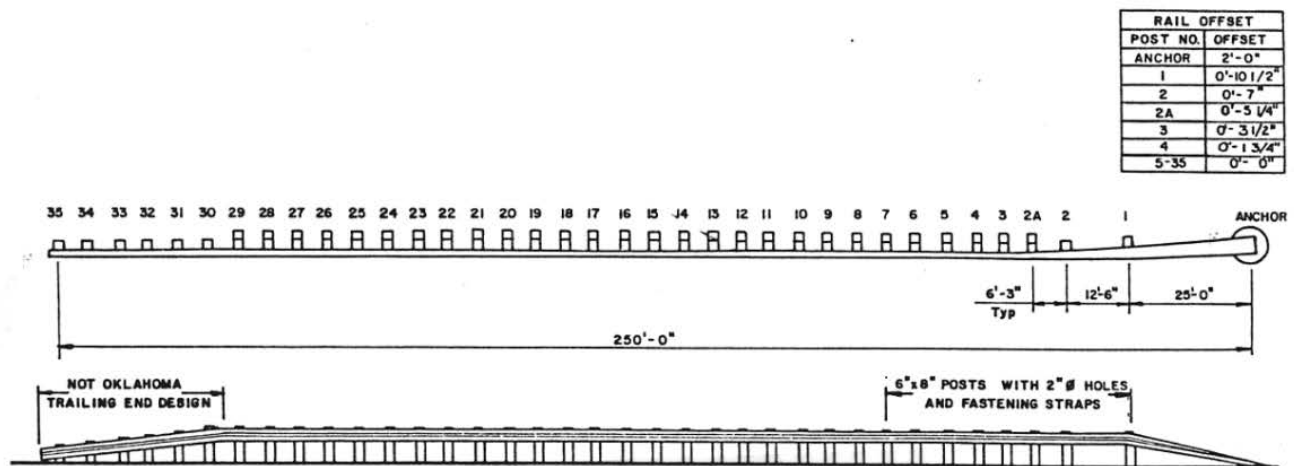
Final Modified Oklahoma Guardrail End Treatment.
